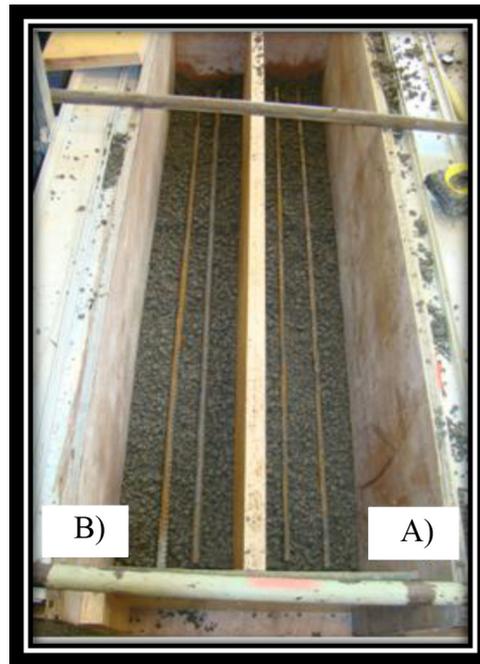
(A) Beam 2 with 2 – #3(2–10 M) rebars, (B) Beam 1 with 2 – #5 (2–15 M) rebars.
